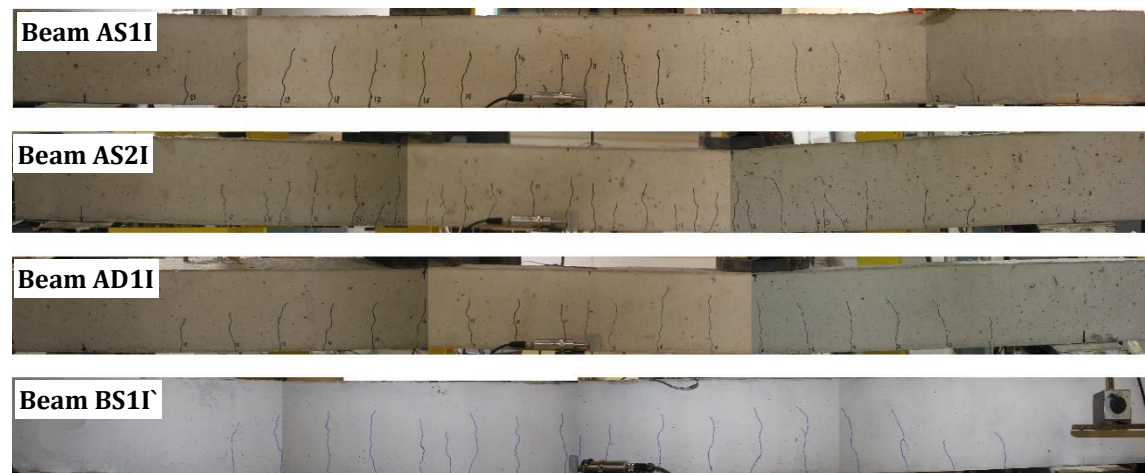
Crack patterns of the strengthened beams subjected to two loading/unloading cycles.
